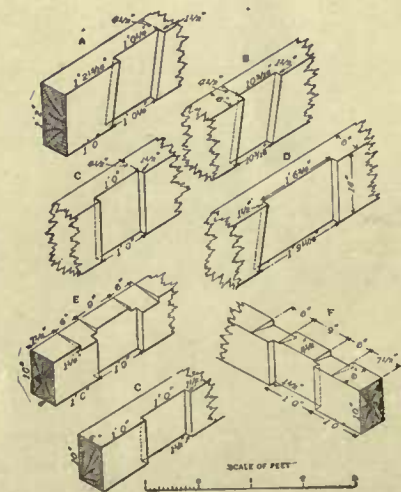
DETAILS OF WALLS AND GIRTS.
